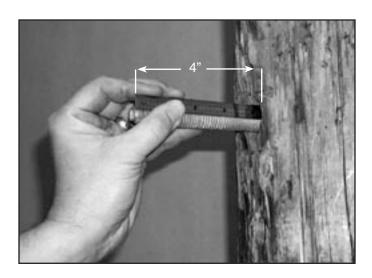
MINIMUM THROUGH-BOLT CLEARANCE
